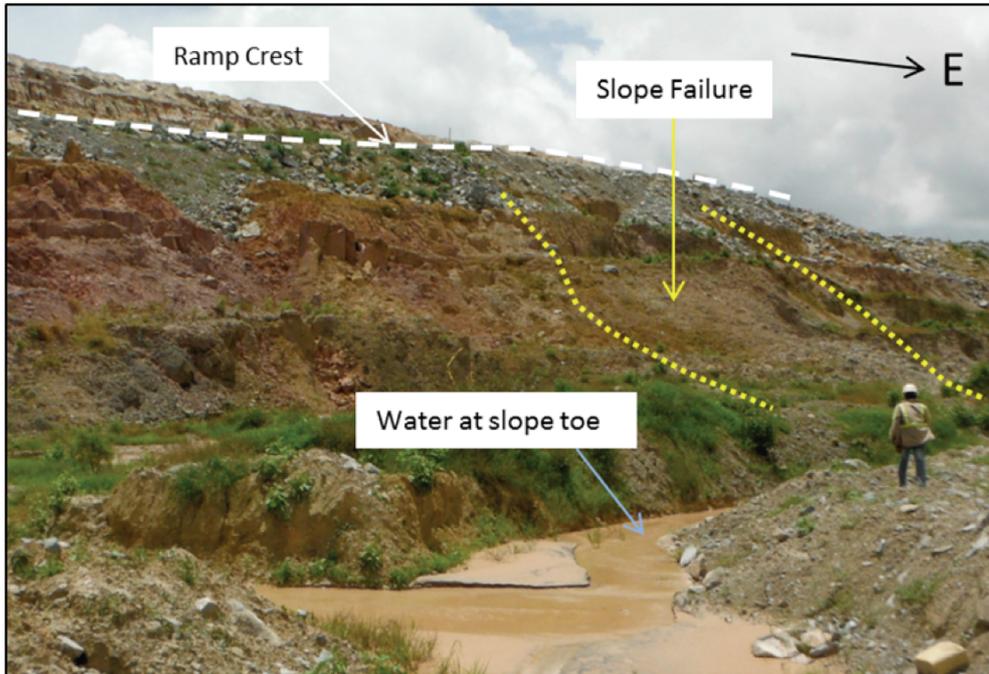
Slope instability in saturated saprolite slopes on the northern wall of Mayo Pit
